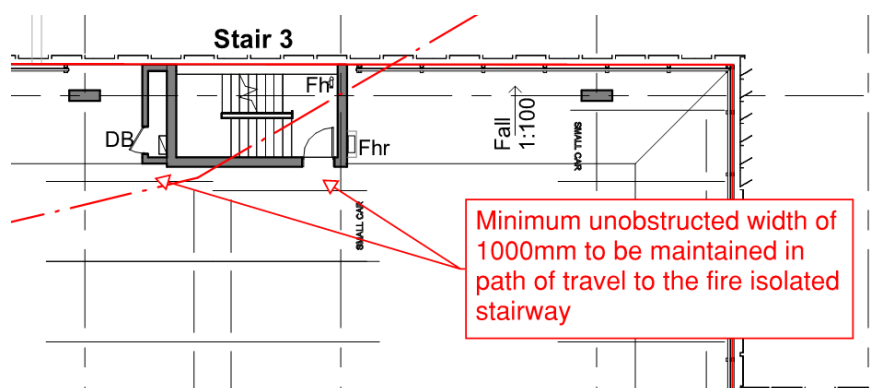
Path of travel leading to exits to have a clear unobstructed width of 1000mm
